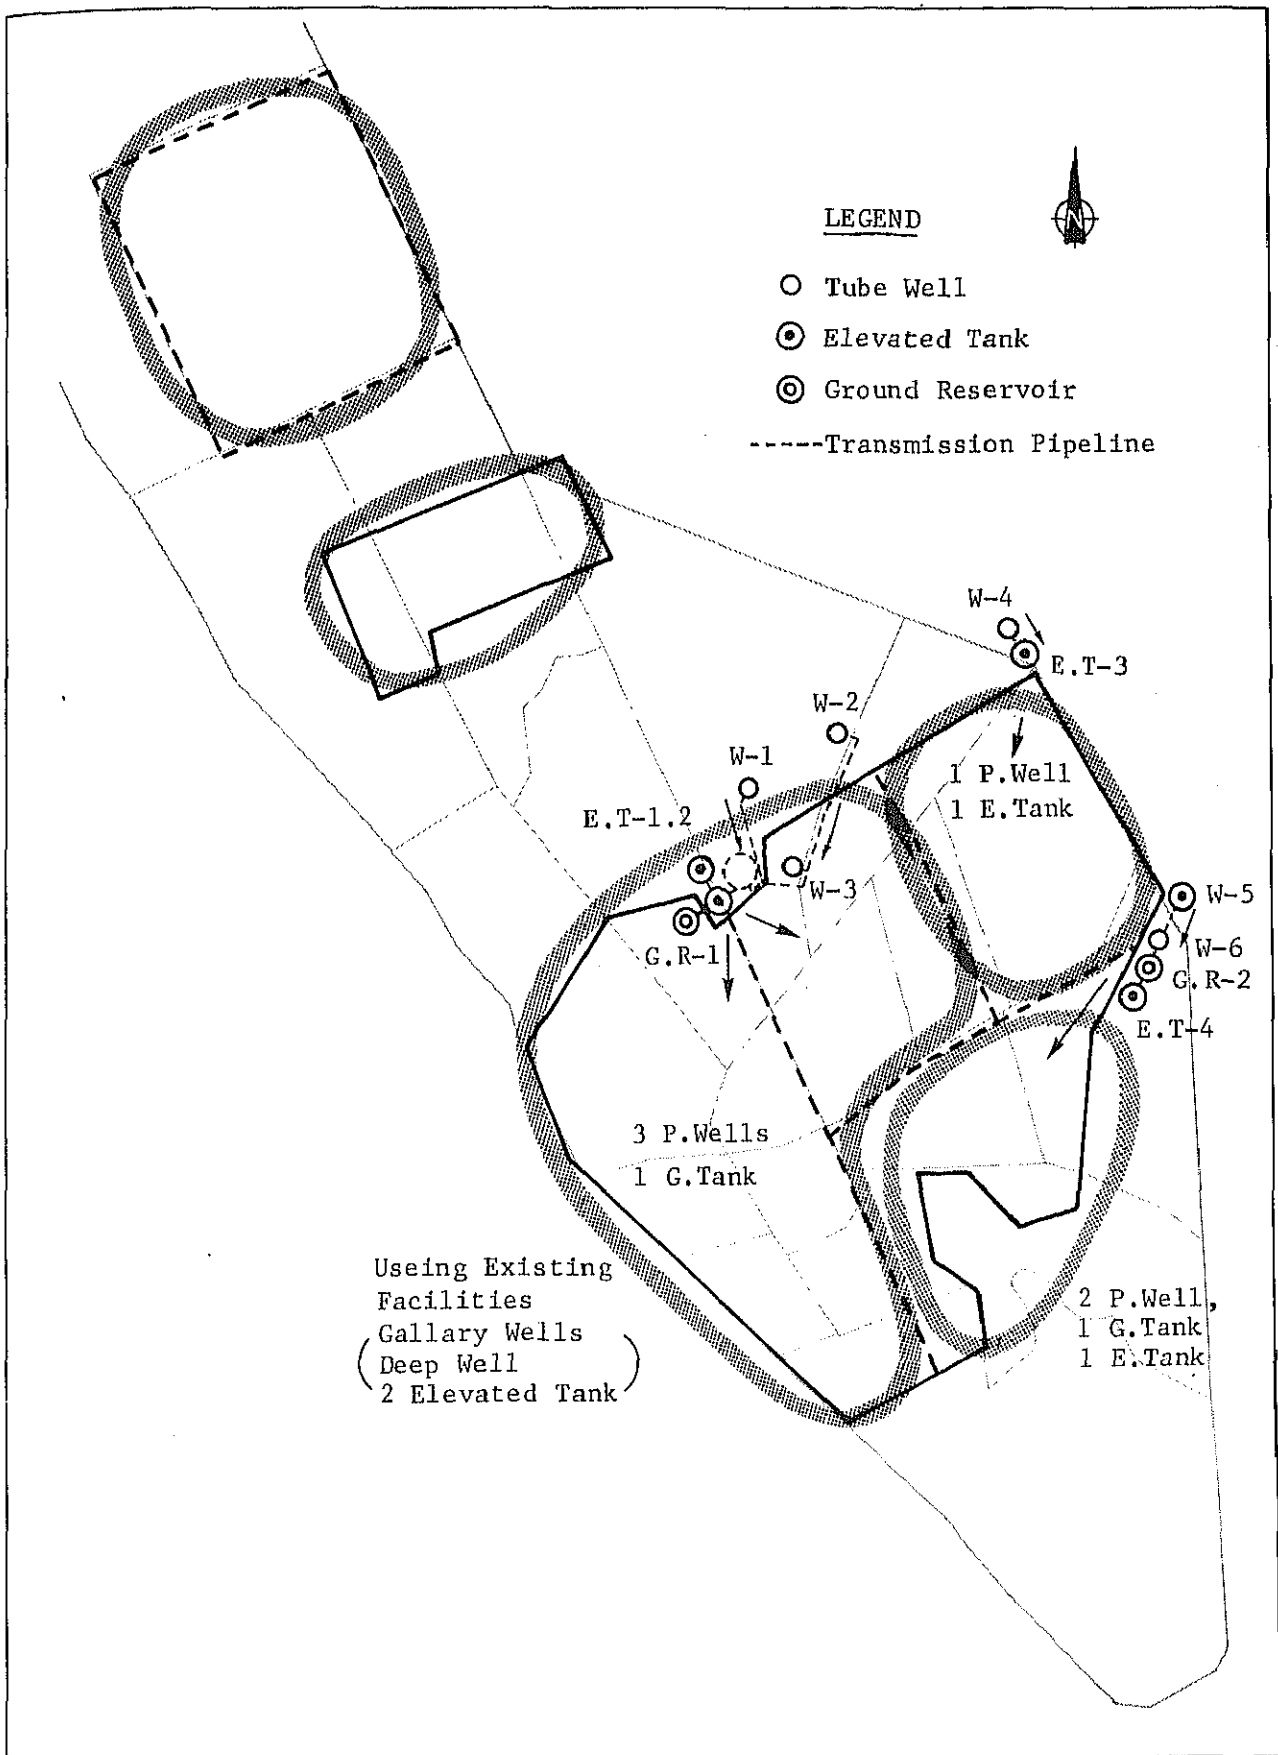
Layout Plan of Proposed Facilities
